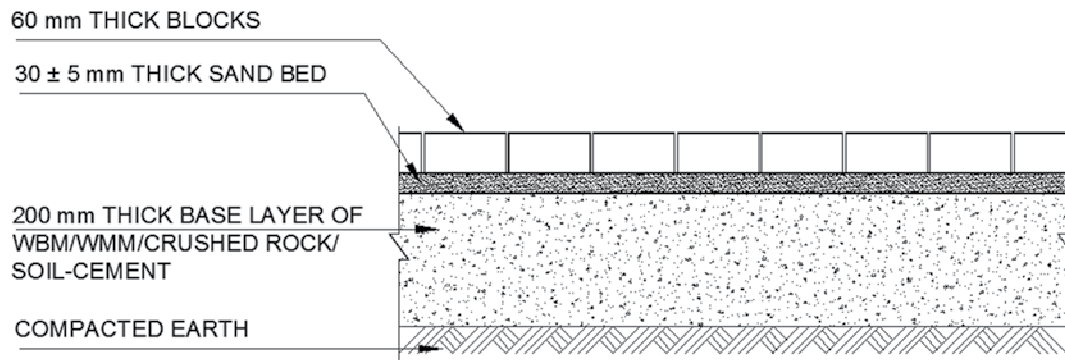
Typical Cross Section of Block Pavement used in Sidewalks/Footpaths/Car-Parks/Cycle Tracks
